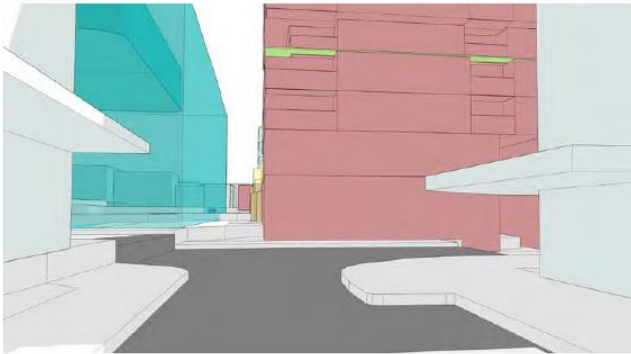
Terminating view from Second Avenue (looking west) with the Planning Proposal built form.
